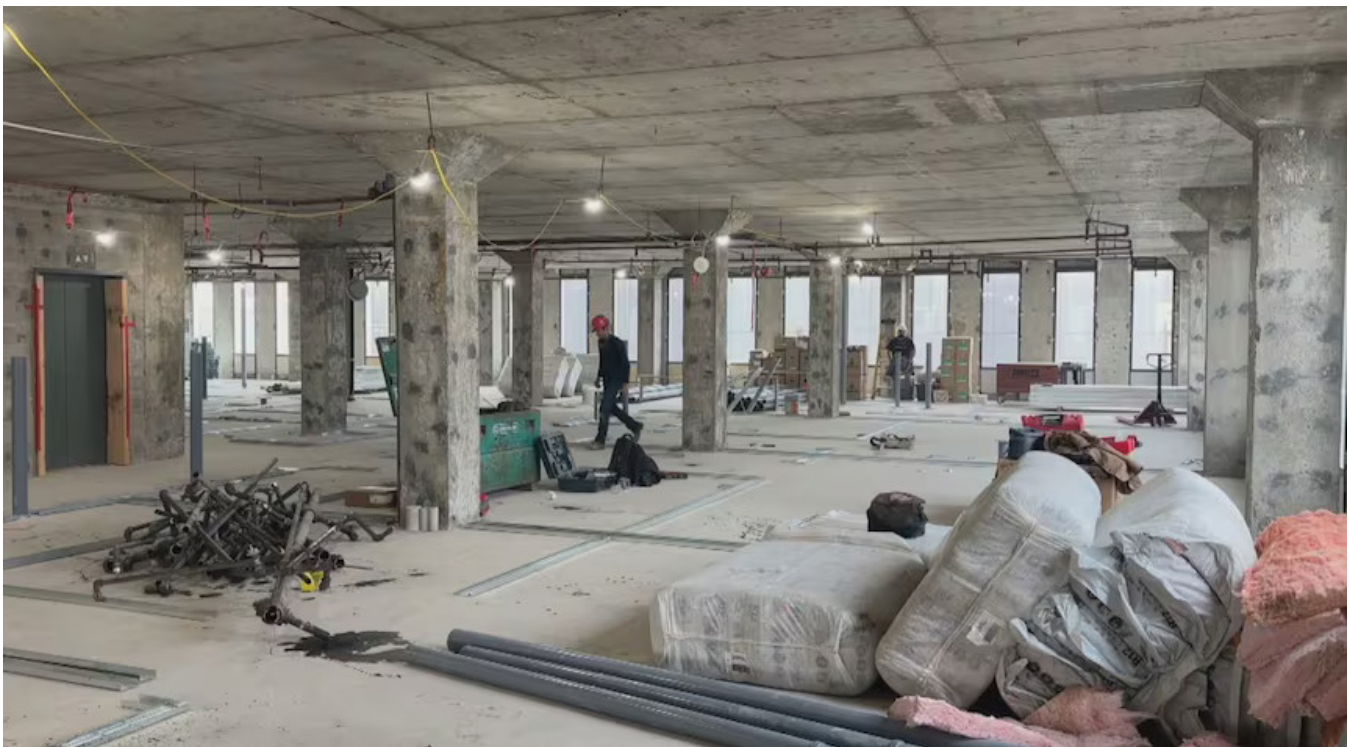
Interior demolition underway at 1660 Hollis Street (Case Study 1, Halifax), as the former office tower was being transformed to a multi-unit residential building in 2021.
